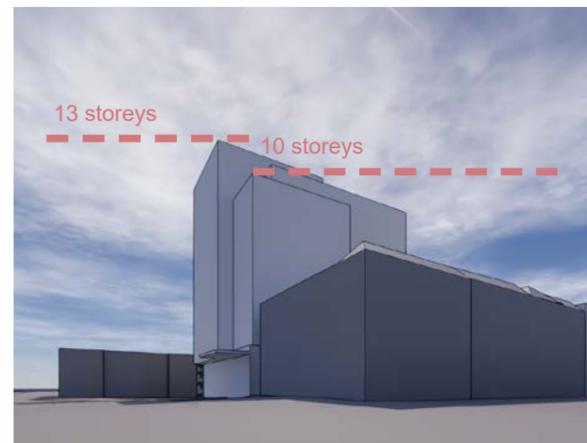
View B from Hunt Museum towards 13 storey building to Bank Place
